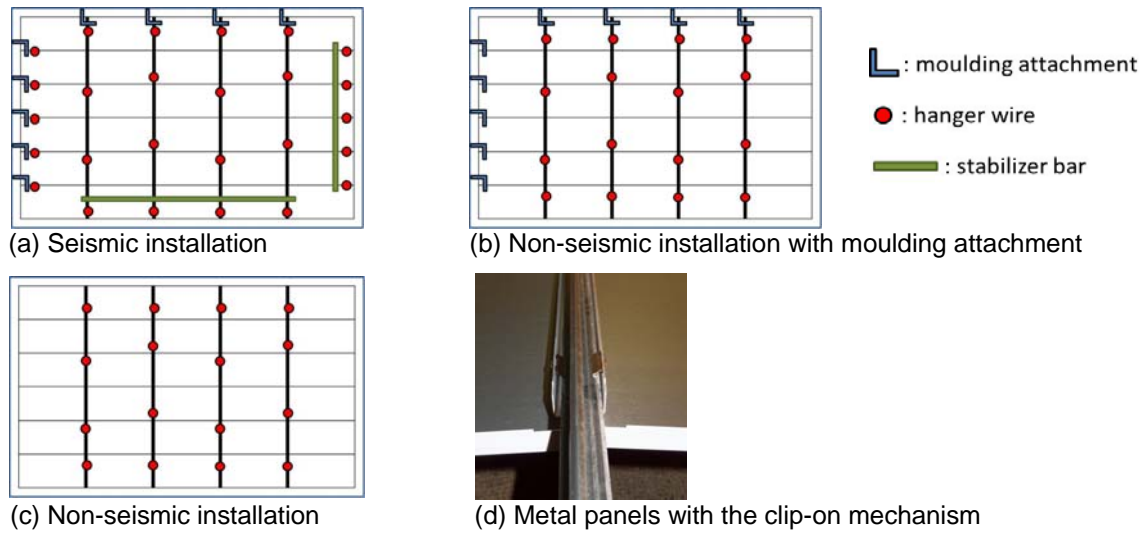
Configurations of the tested ceiling specimens with/without seismic installation
